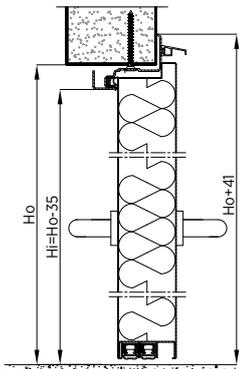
Installation of the ECO Tech single-leaf seamless door with a corner frame without a thermal break to a steel structure - vertical cross-section
